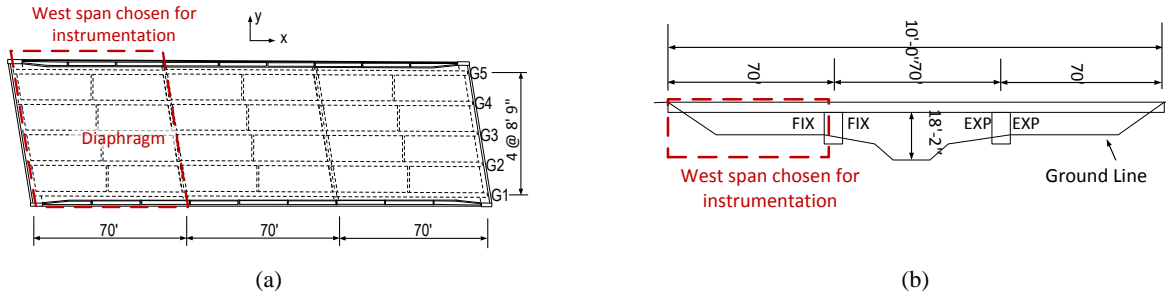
SR113 bridge over Dry Creek: (a) plan view; (b) elevation view
